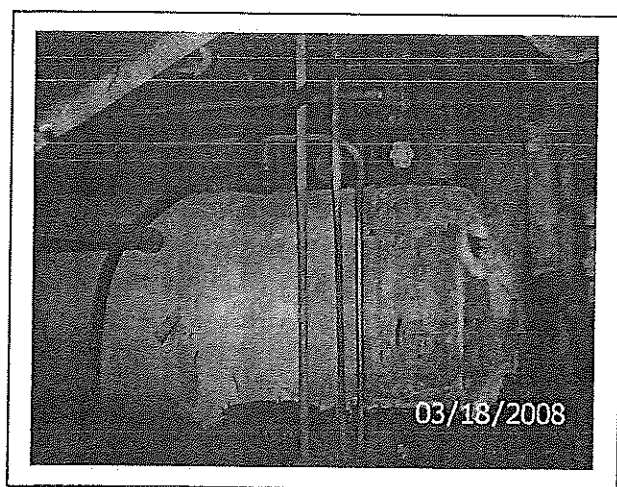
Viewing white tank insulation, Basement, mechanical room near tunnel.
